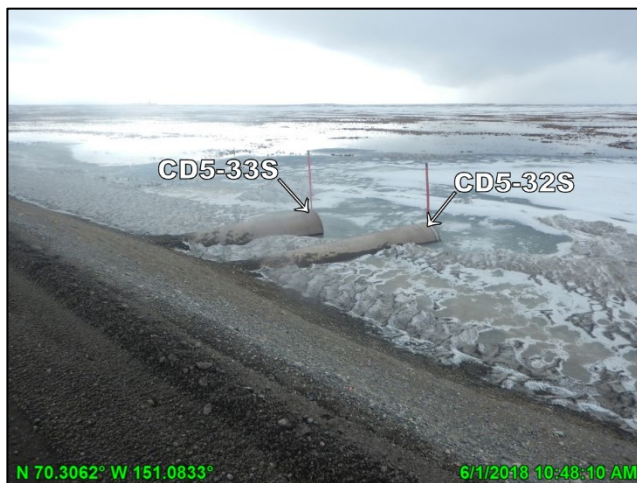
Culvert CD5-32S and CD5-33S along the CD5 road, looking southeast; June 1, 2018
